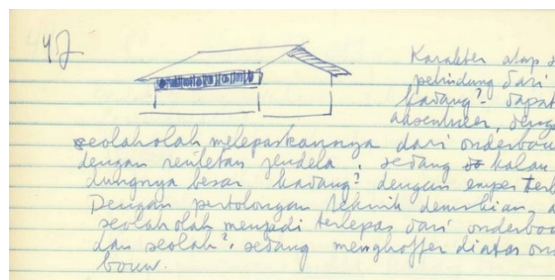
Silaban's sketches of roof accentuation in small buildings¹⁴⁾
